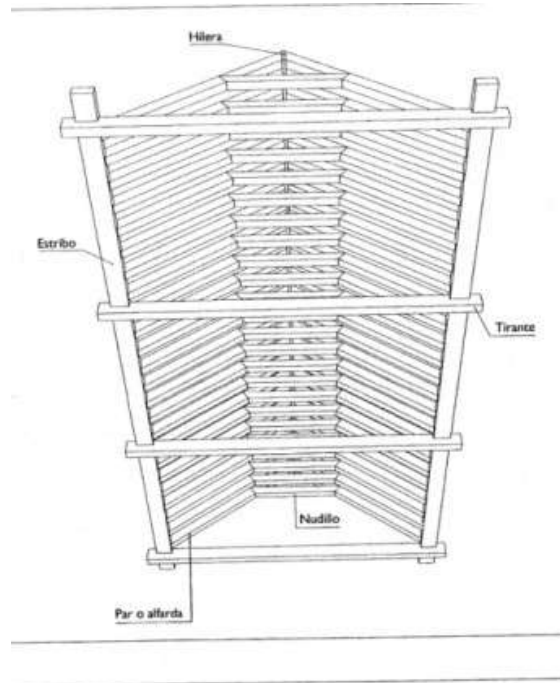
Wooden ceiling detail / armadura de par y nudillo Anonymous.
